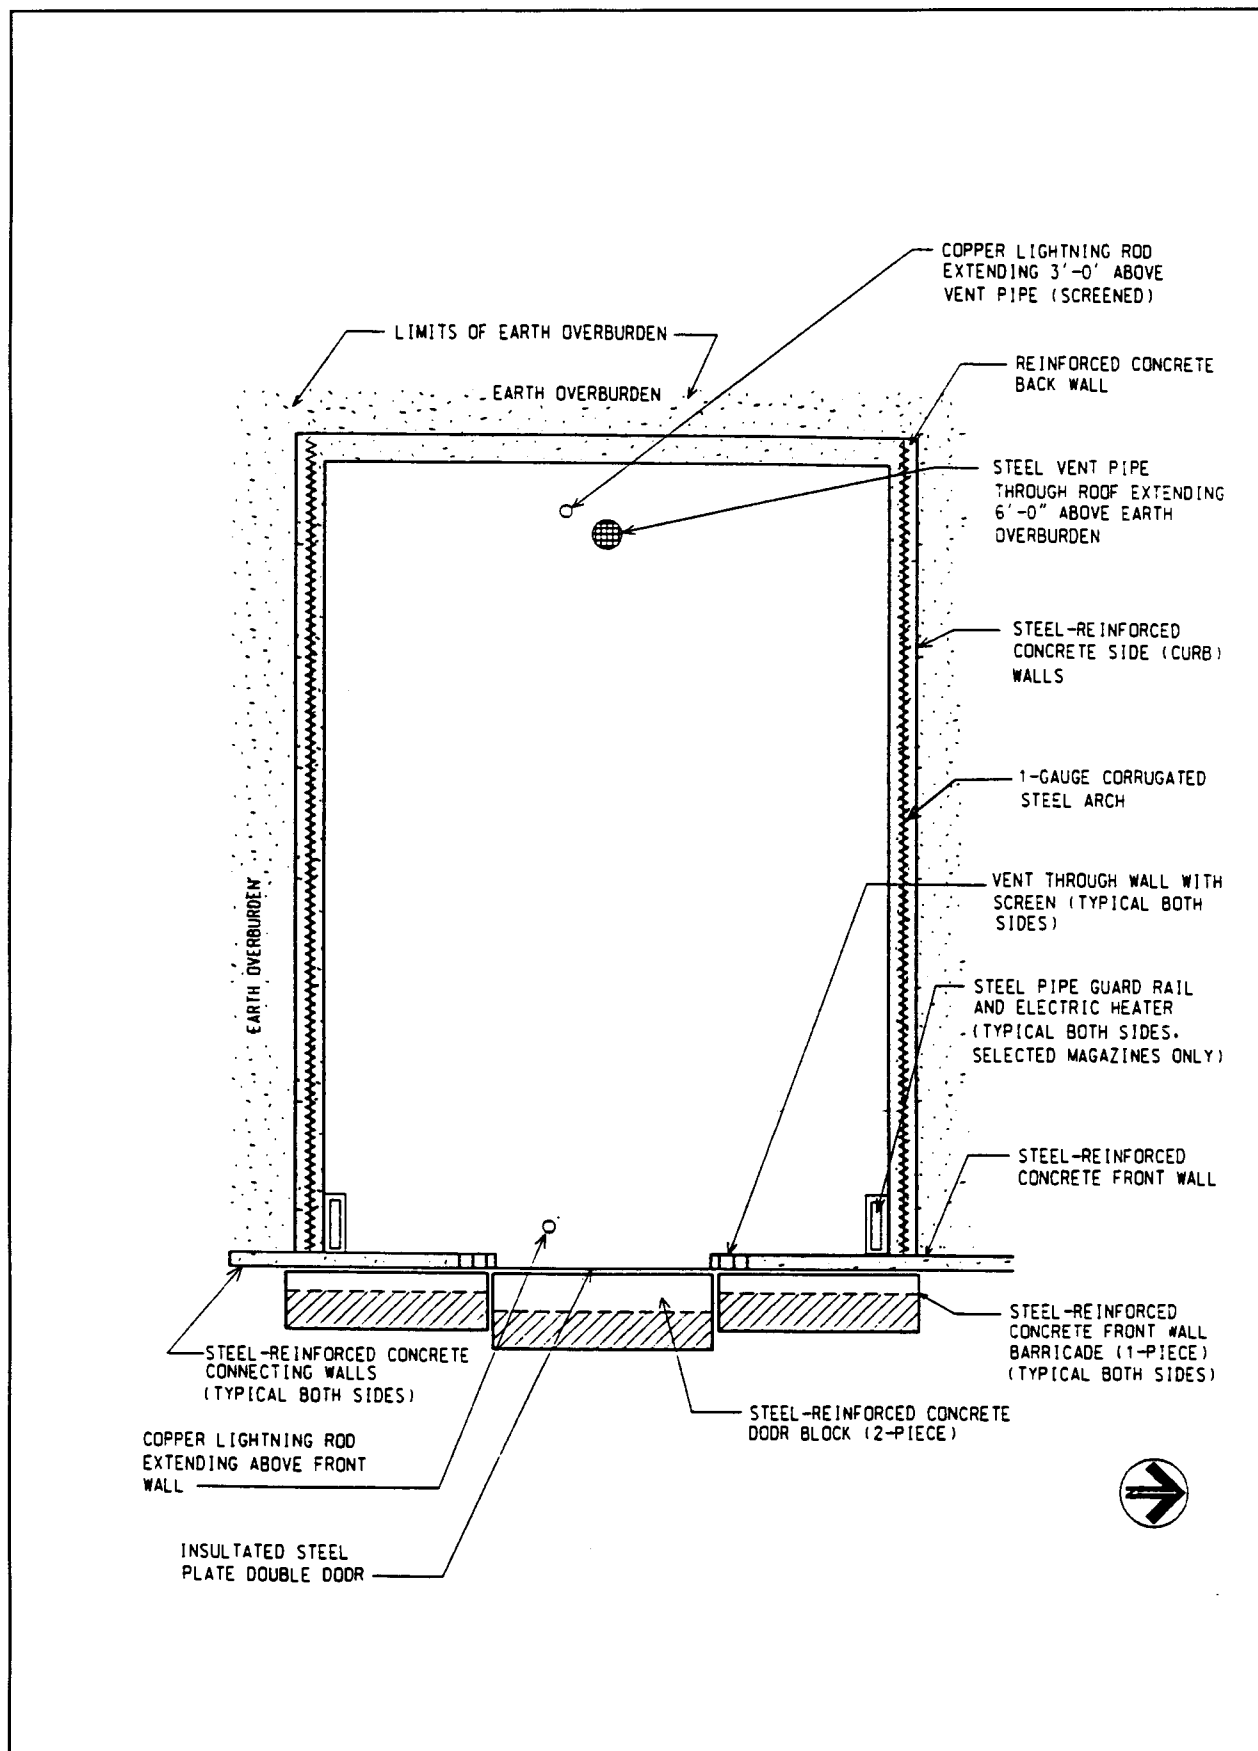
Steel Arch Construction Magazine Layout (Top View)
